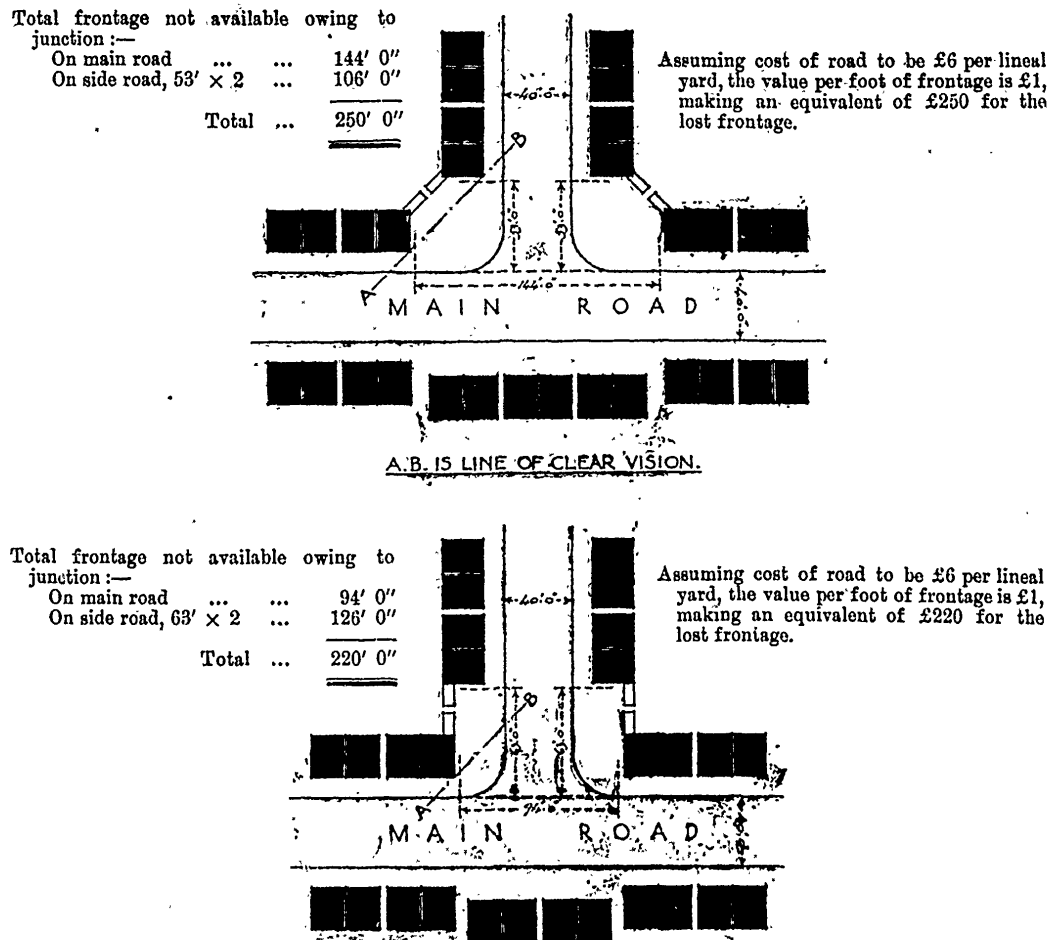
Proposed frontage of new houses. Tudor Walters Report.
